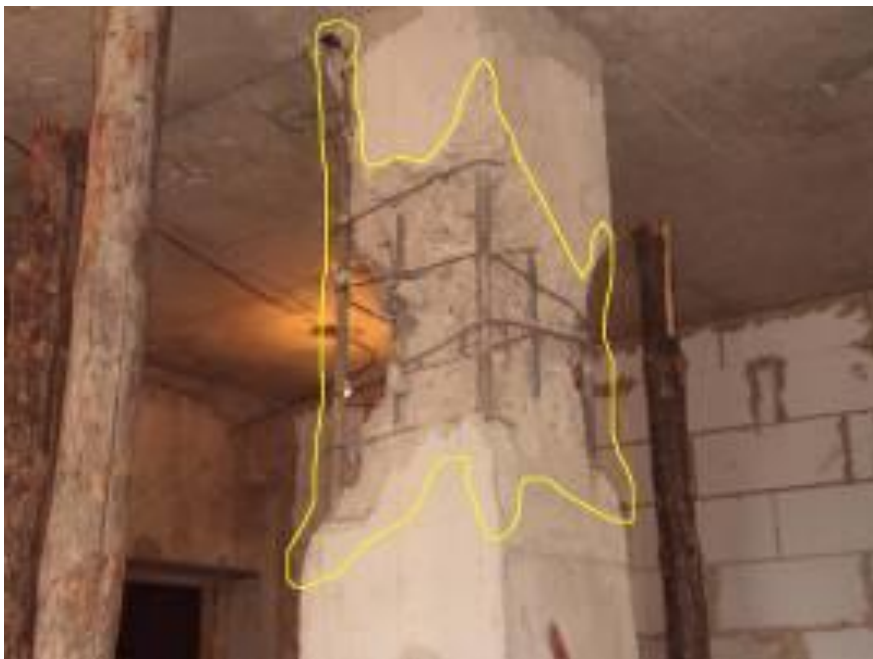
Column concrete failure with bare and corroded reinforcement
